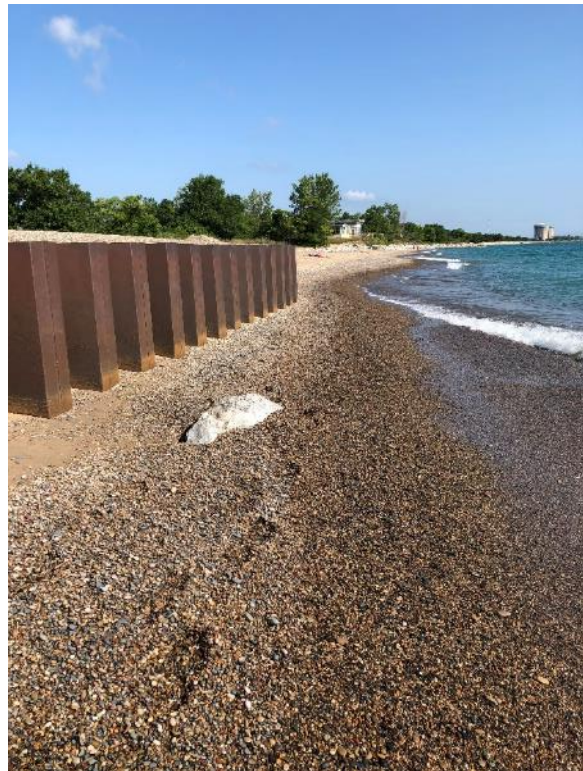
Sheetpile Shoreline, ST 214+00 Looking North
